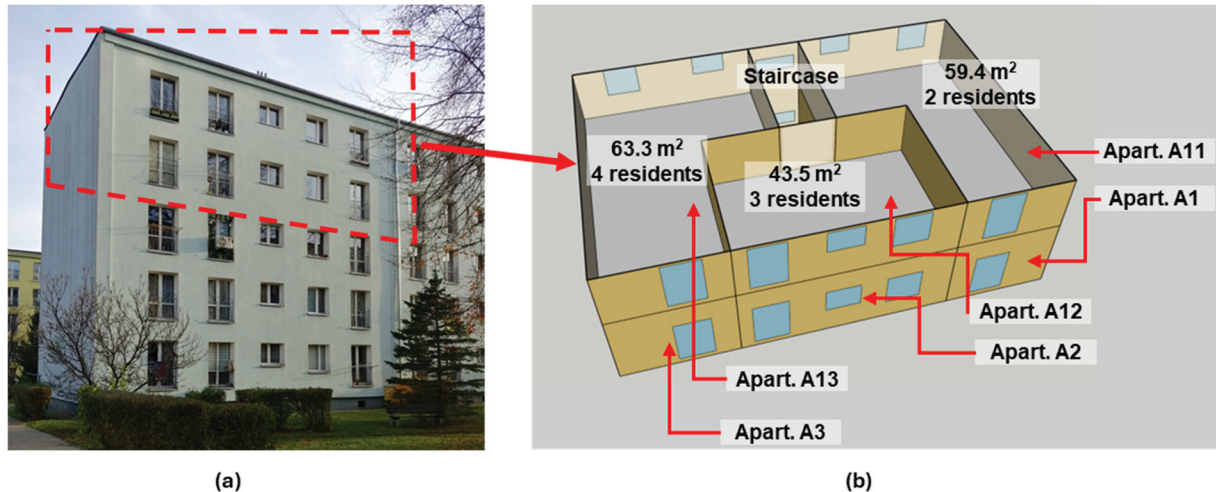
Building under consideration: (a) building view and (b) view of thermal model geometry.
